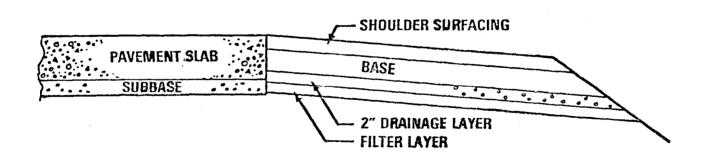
Providing New Drainage Capabilities Through the Shoulder (25)
